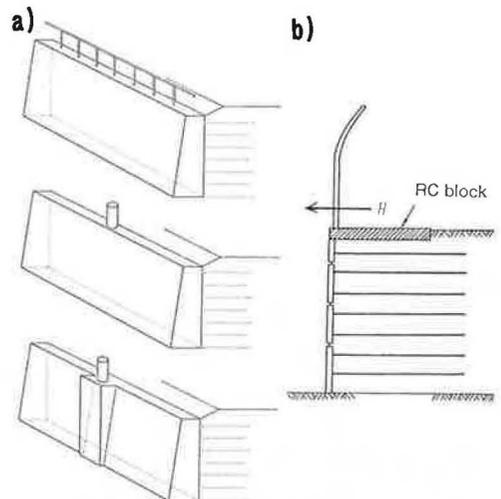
a) Some examples of structures constructed directly on a full-height rigid facing, and b) a reinforced soil retaining wall with a deformable panel facing to accommodate a foundation of structure (Tatsuoka et al., 1994)
